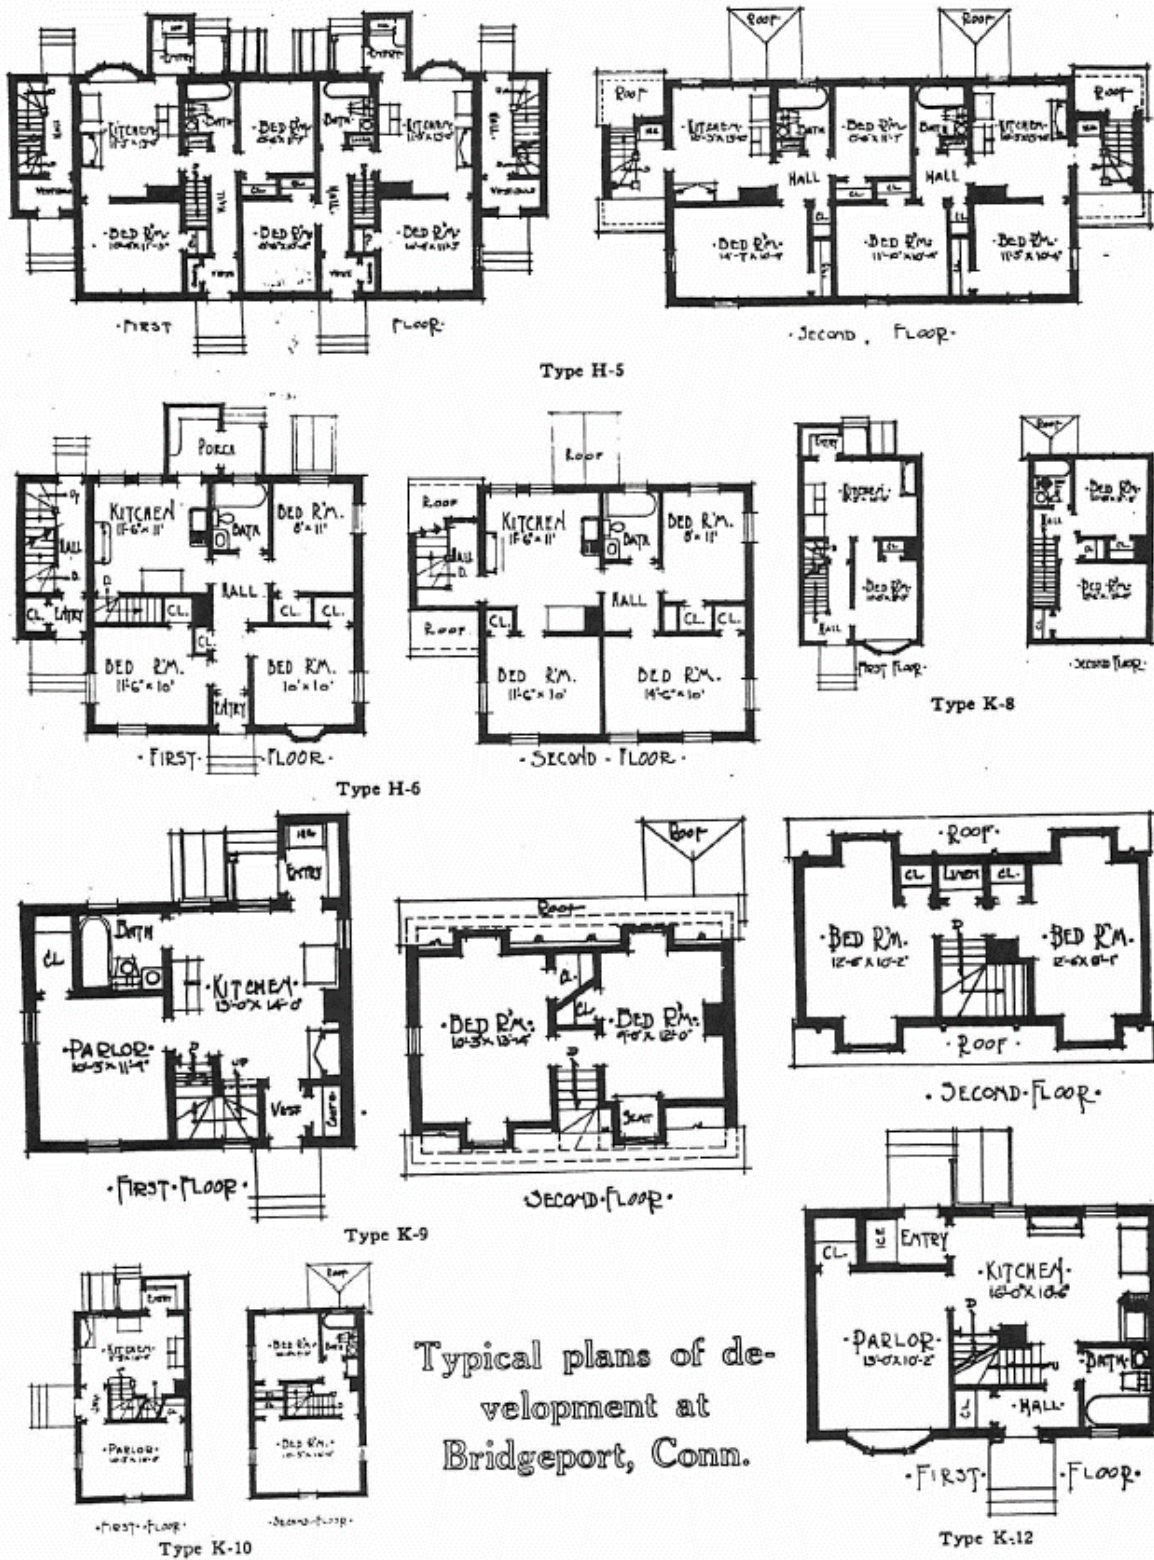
Floor Plans H5, H6, K9, K10 & K12
